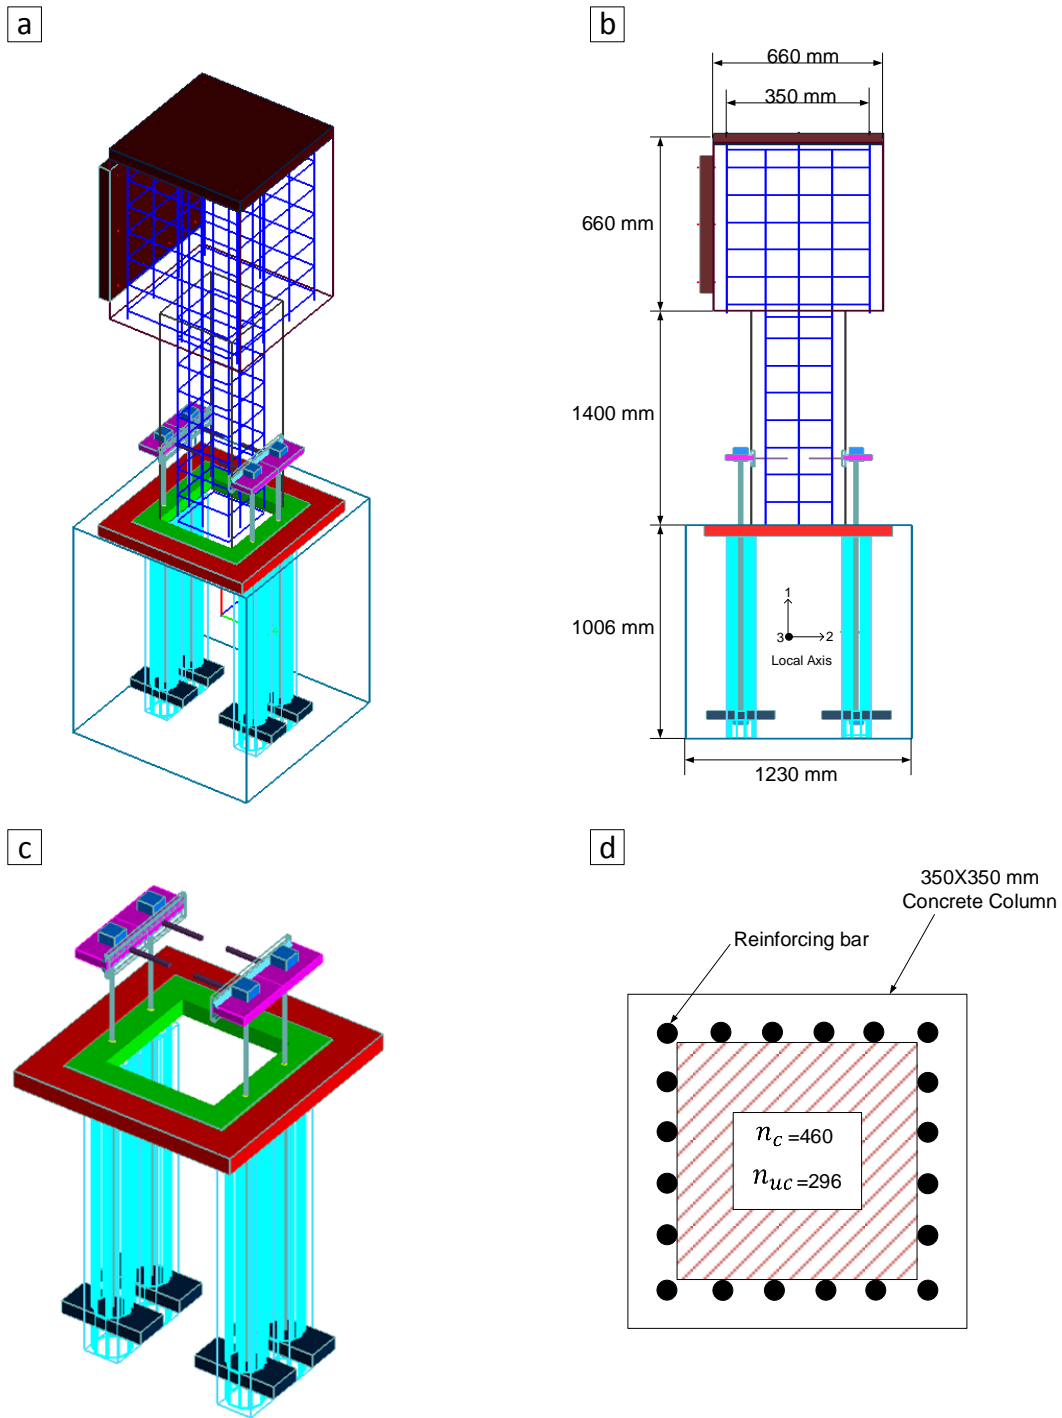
Column showing the 3D model of the specimen and rocking connection, (a) Model perspective view, (b) Model section view and local axis, (c) 3D rocking connection, (d) Column cross section
